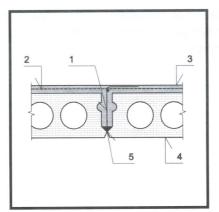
Hollow Core Slab to Slab Joint Detail
